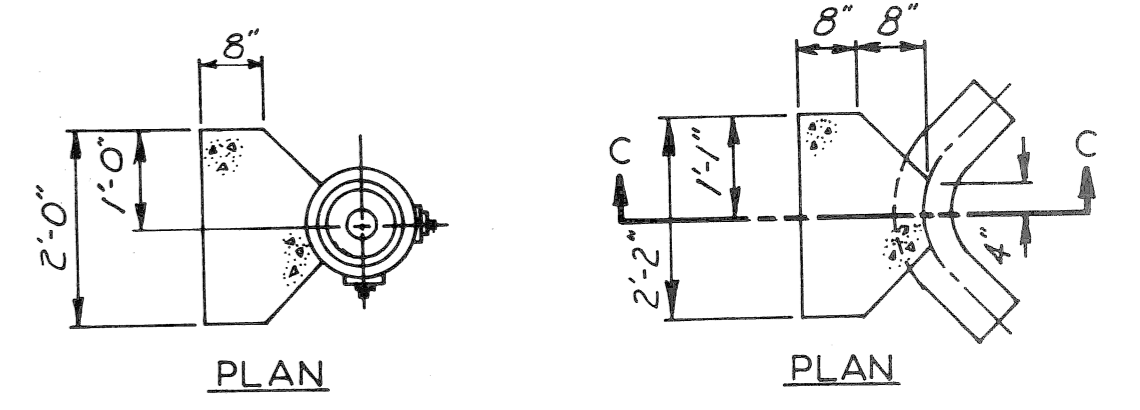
" HYDRANT INSTALLATION OFF SET
